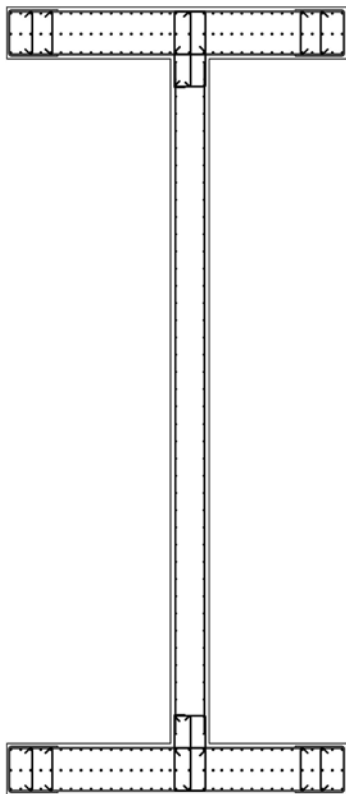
Pier 4 @ Lower Level 1 with Boundary Elements
